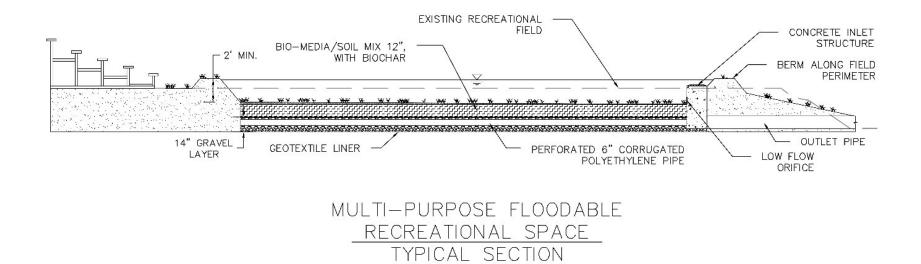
Multi-purpose floodable recreational space typical section using berms and bio-soil to maximize storage and infiltration
